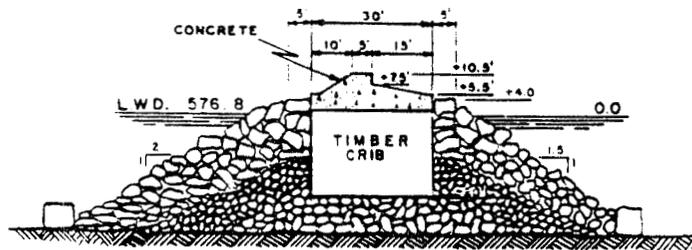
Typical east structure cross sections, Michigan City Harbor, Indiana
